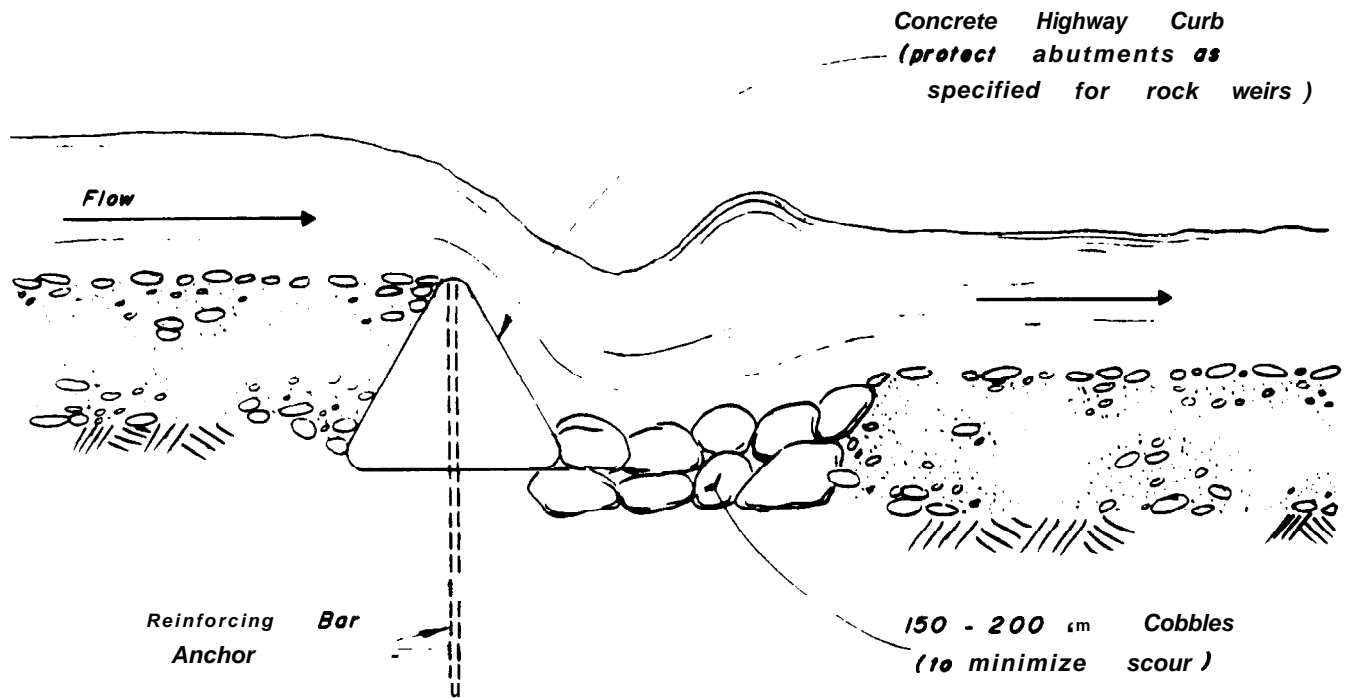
Concrete highway curb used to stabilise gravel and maintain channel grade. The weir can be sloped towards the centre to facilitate fish passage at low flows. This type of weir is ideal for drops not exceeding 230 mm and for streams where large rocks are not plentiful (from S.E.G. 1980).
